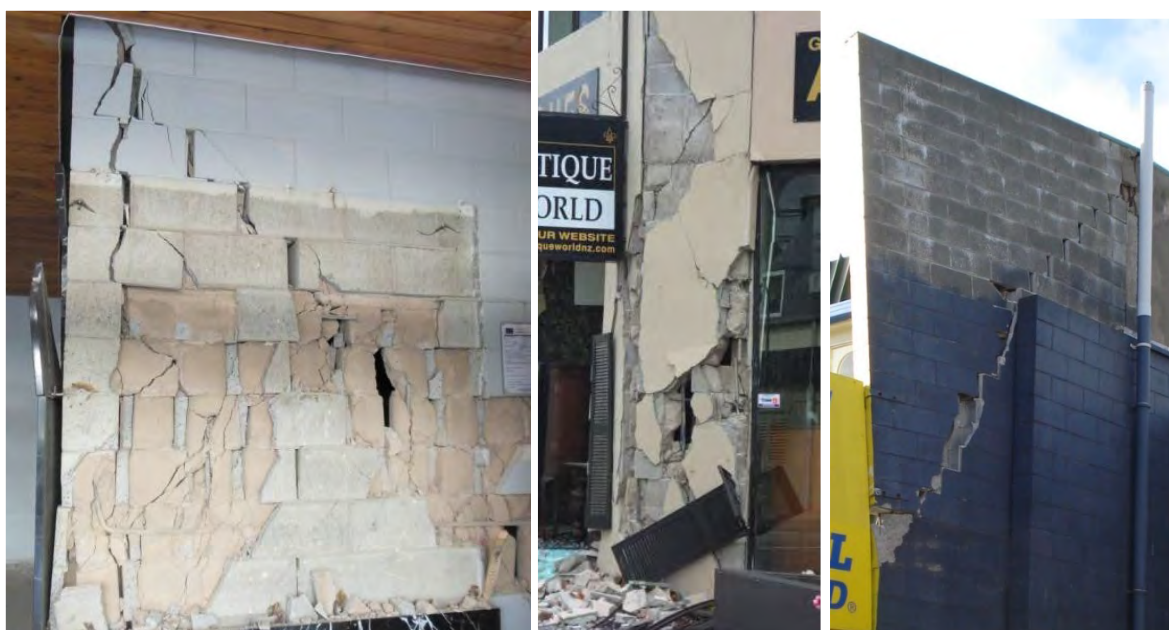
RCM damage in earthquakes. Note in the right hand image that many cells are unfilled
